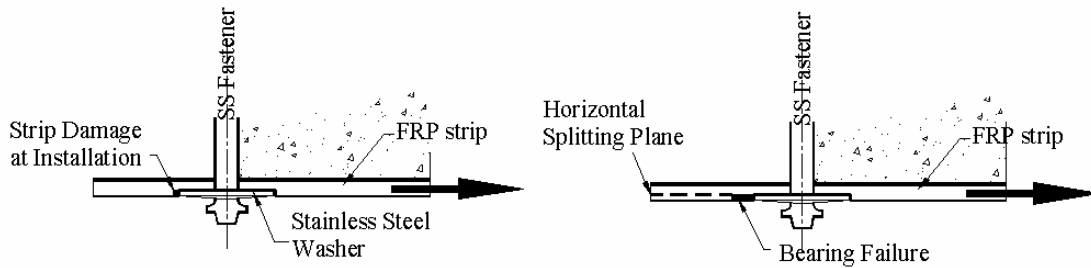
Failure mechanism at location of the stainless steel fastener
